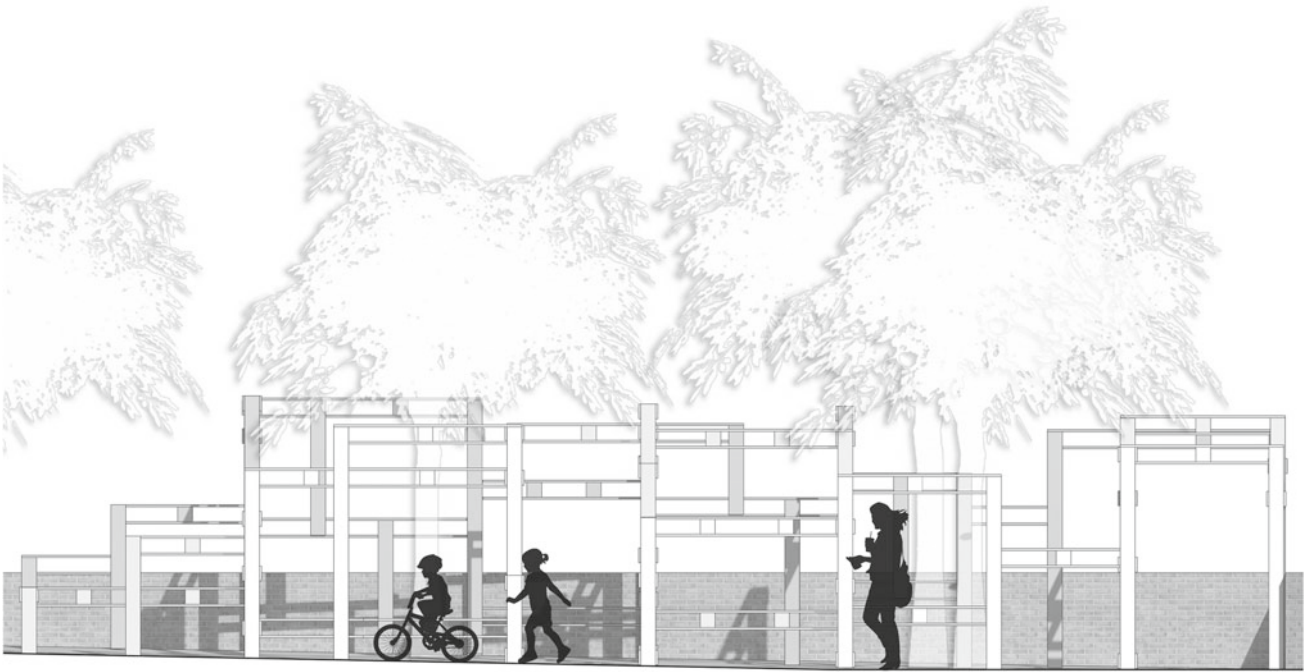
SoundGarden elevation drawing. *Author* Jacob Lucas
